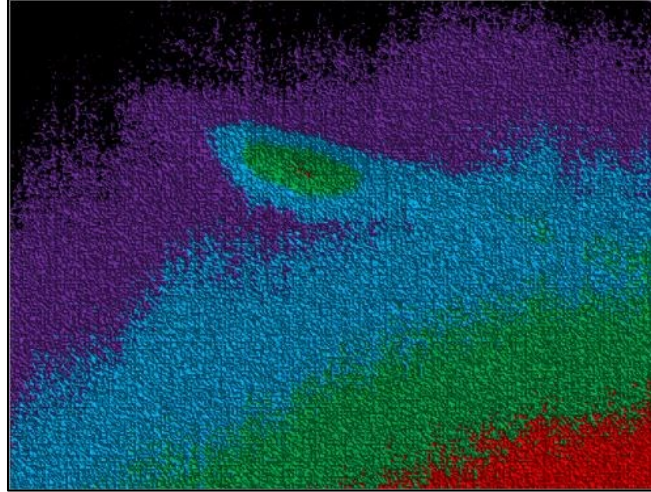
Hot Spot 1 on 4/28/12 at 12:39 PM (North Side of Wall 2)
